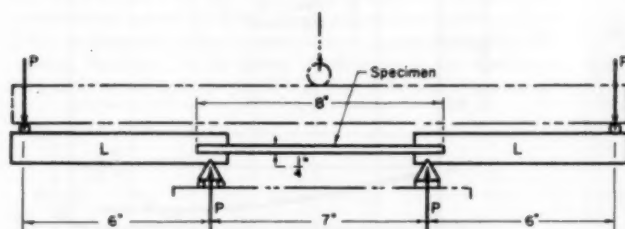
LOADING ARRANGEMENT FOR PLATE SPECIMENS
